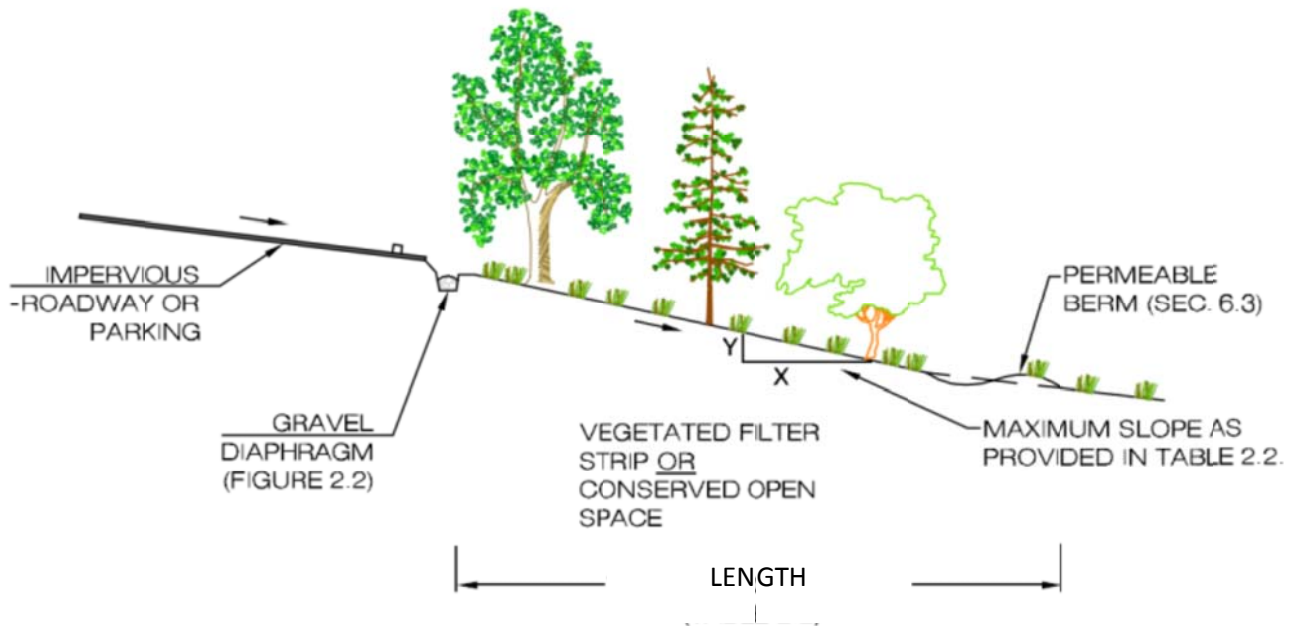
Typical Configuration of Sheet Flow to Filter Strip or Conserved Open Space (Source: VA, 2013)
